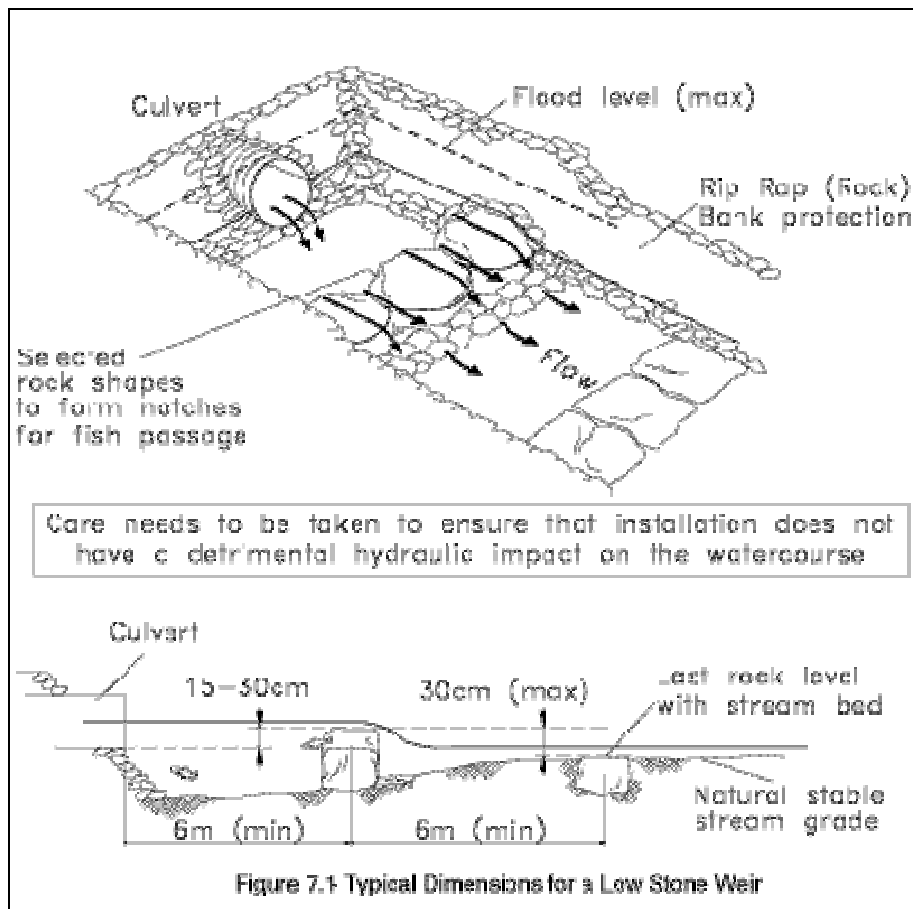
Detail for construction of a low level weir to alleviate flow and perching problems at a culvert outlet or scour protection apron (extracted from Anon, 2000)
